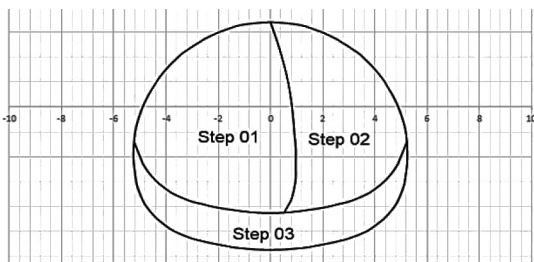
Transverse cross-section and tunneling order adopted for “Algiers Subway”
